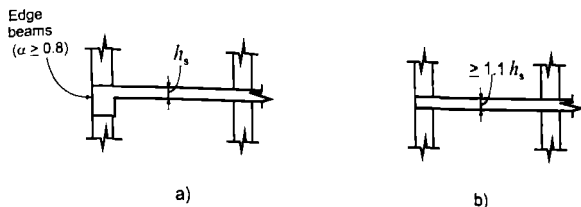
Additional requirements for end spans: a) a slab with edge beam, and b) a slab without edge beam.
